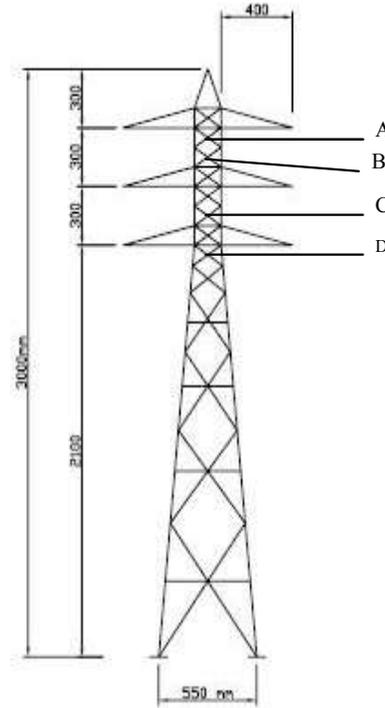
Layout of the considered steel tower (all dimensions are in mm)
